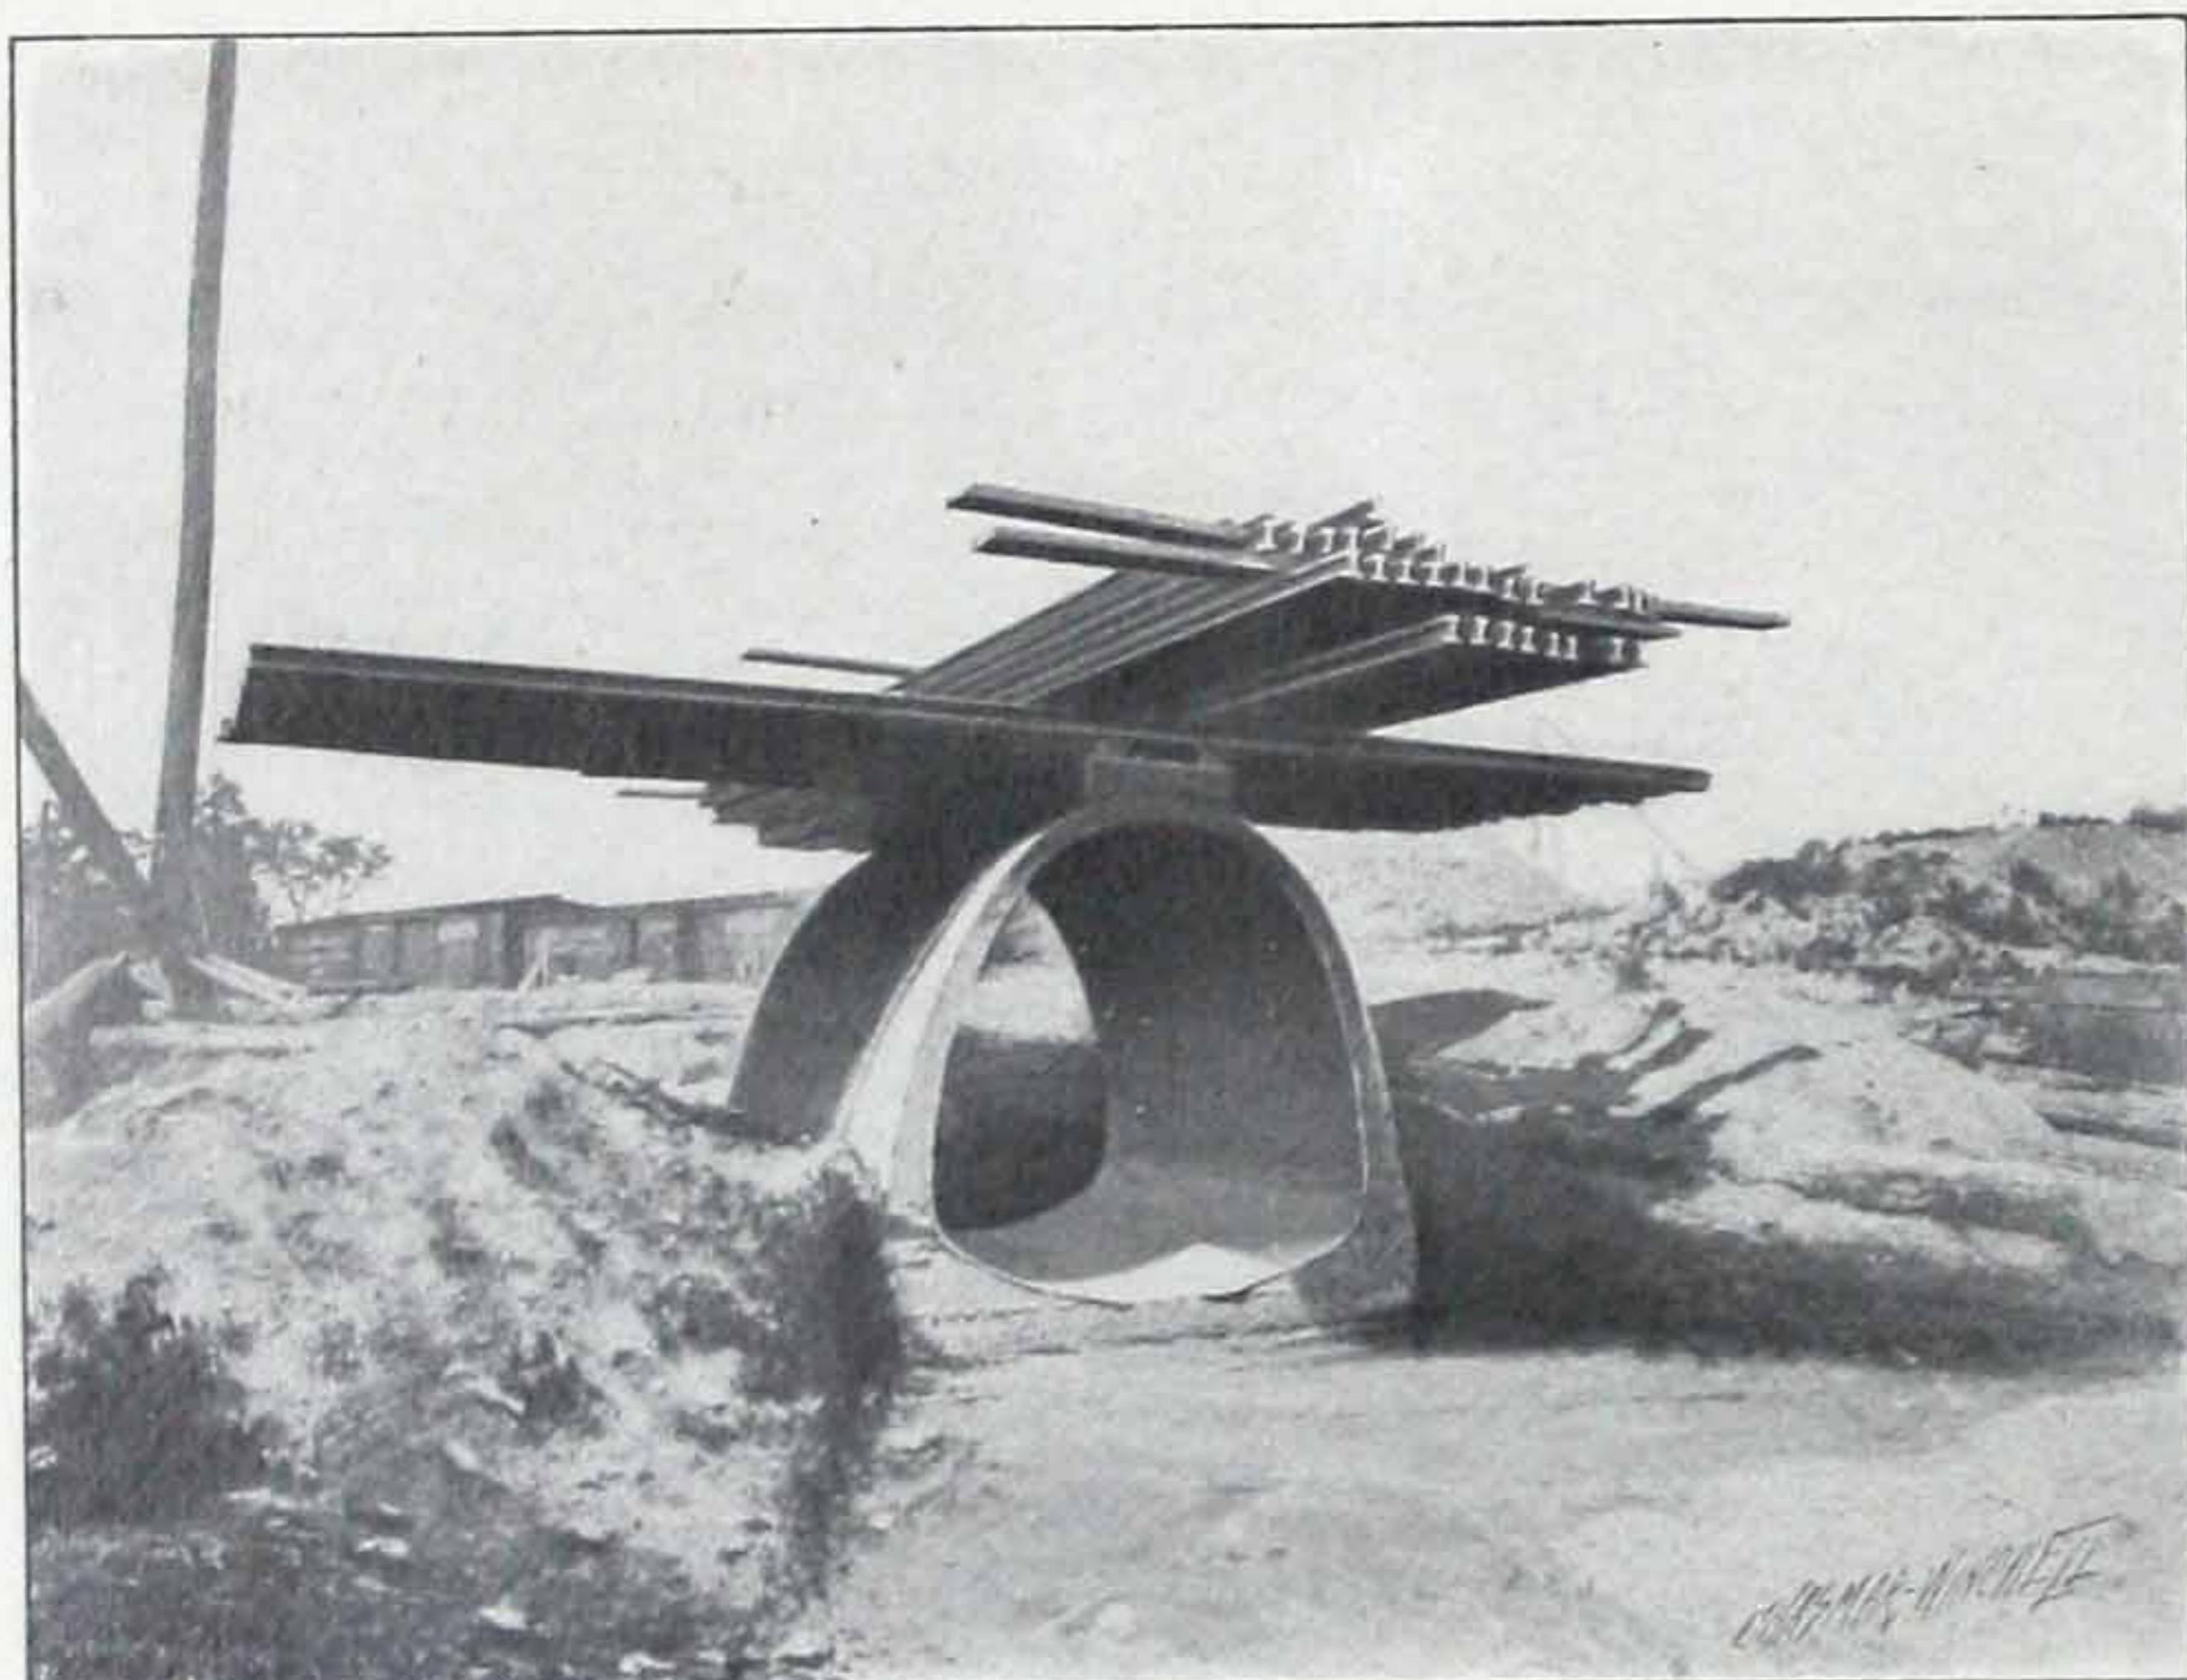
Section of Water Conduit Loaded with 25 Tons of Steel Rails.
